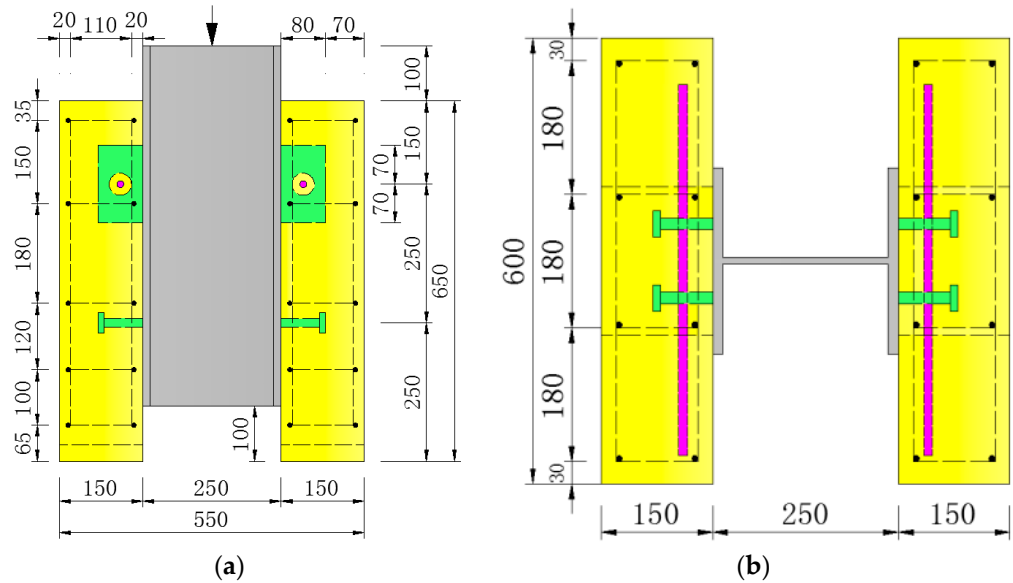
Details of push-out specimen (LT-C) (Unit: mm): (a) Side view of LT-C; (b) Top view of LT-C.
